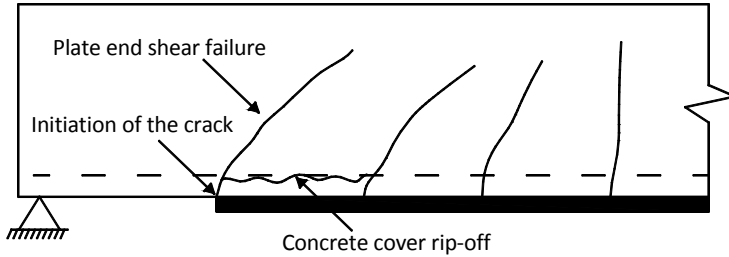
Plate-end shear failure and concrete cover rip-off
